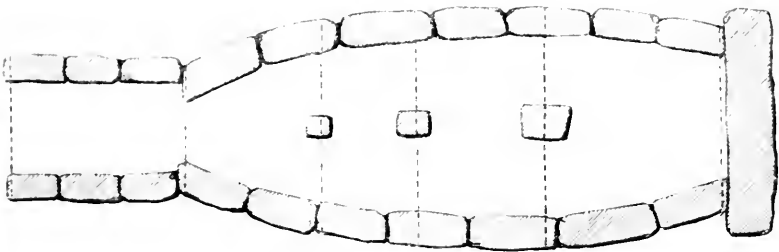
Ground plan. Length, about 86 1/2 ft., greatest width 22 ft.
